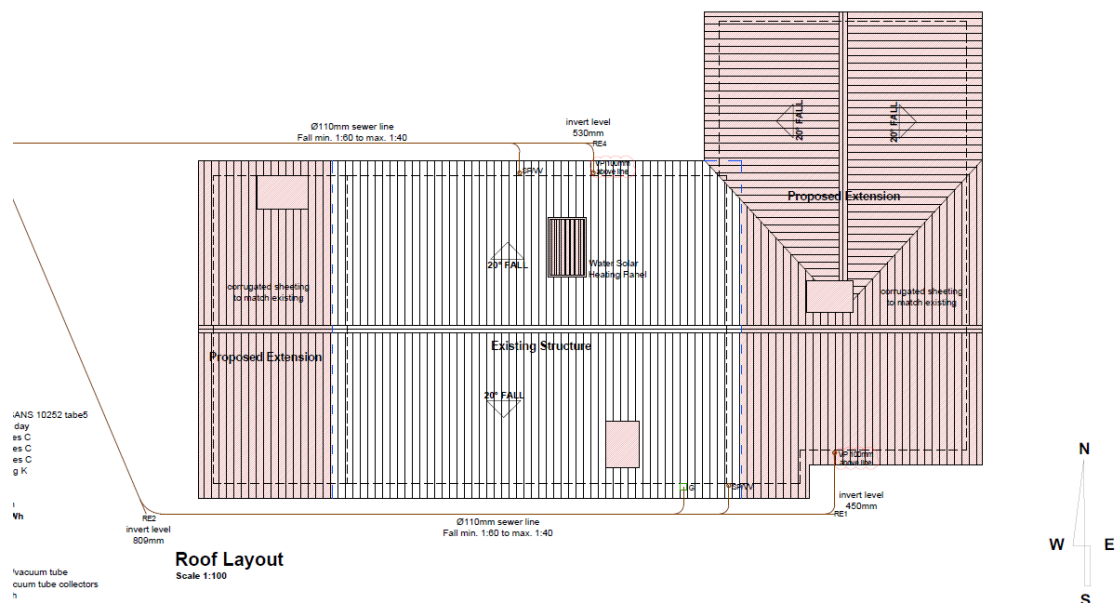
Site layout showing the extent of existing building vs what is proposed to be developed
